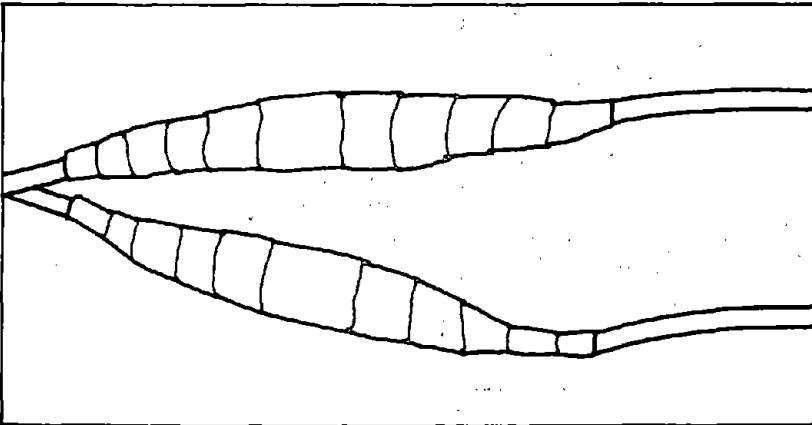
Procedure for splicing feeder cable and lead-in.
